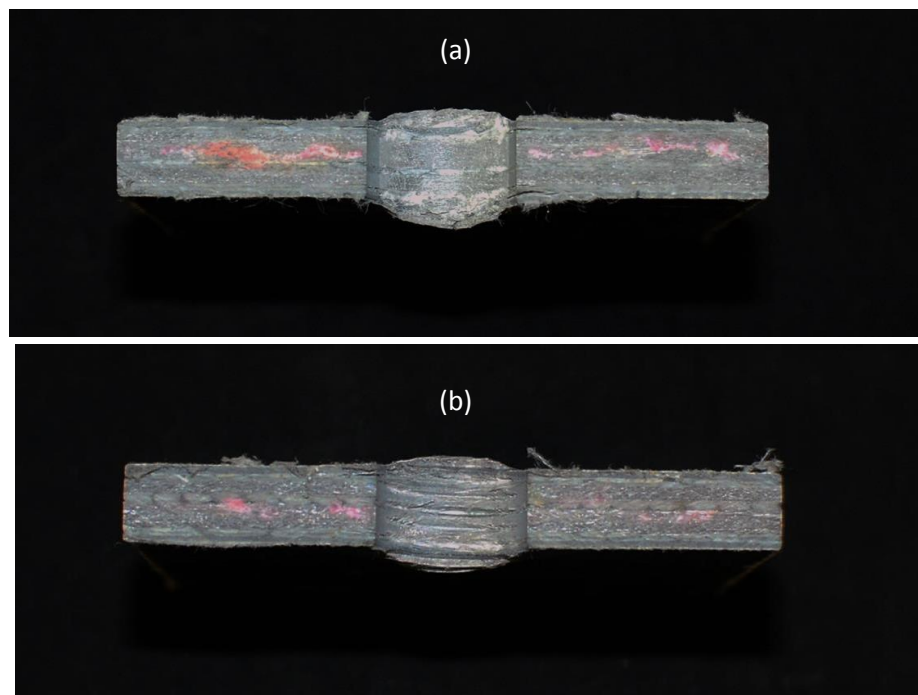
A Failed Pin-bearing Specimen of Flange Material after Hot-wet Conditioning in Distilled Water at 40°C for 6 months and tested with a (a) Plain Pin and (b) Threaded Pin
